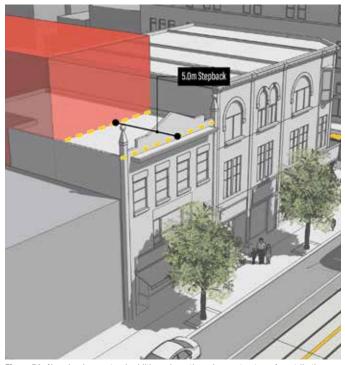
New development and additions above the primary structure of contributing properties shall provide a minimum stepback of 5.0 metres from the streetwall fronting onto Queen Street West.
